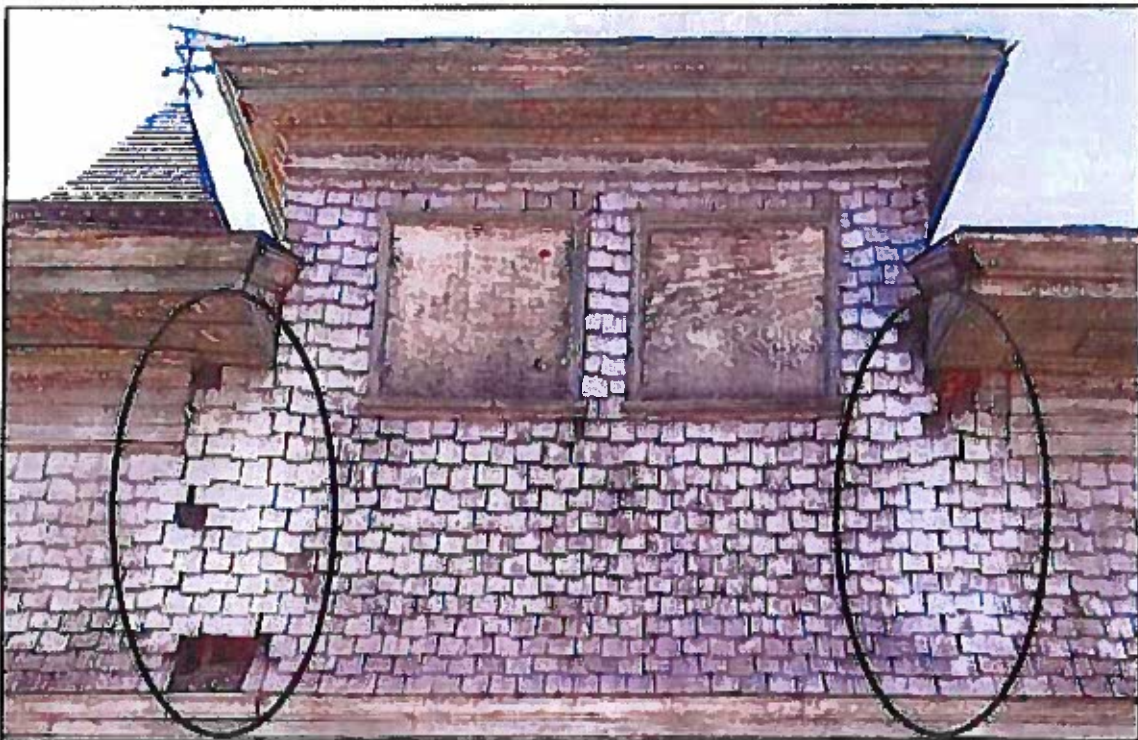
Shingle band below Dormer #4 on east facade showing damage to shingles from form former roof leak. Shingles in the indicated areas will require complete replacement to correct the damage and make the wall water-tight.
